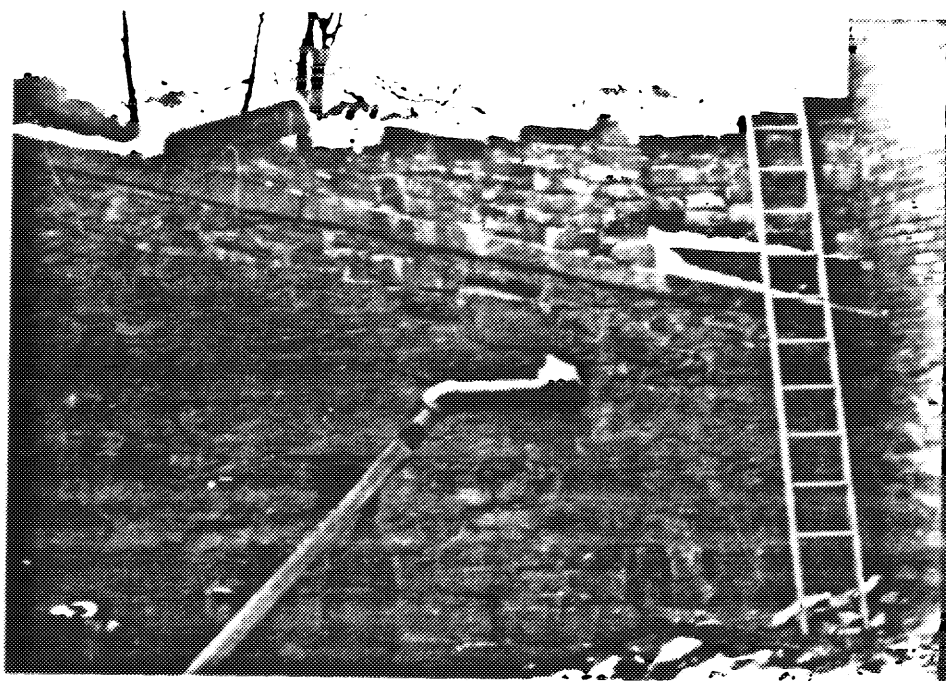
Seepage zone at contact of bedrock and masonry (Left of ladder).
